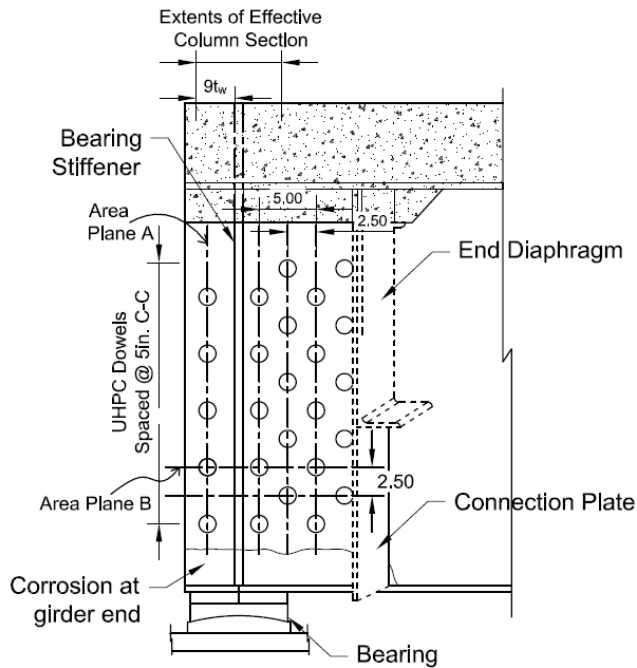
Sample connector arrangement with 0.5-in. threaded rods
